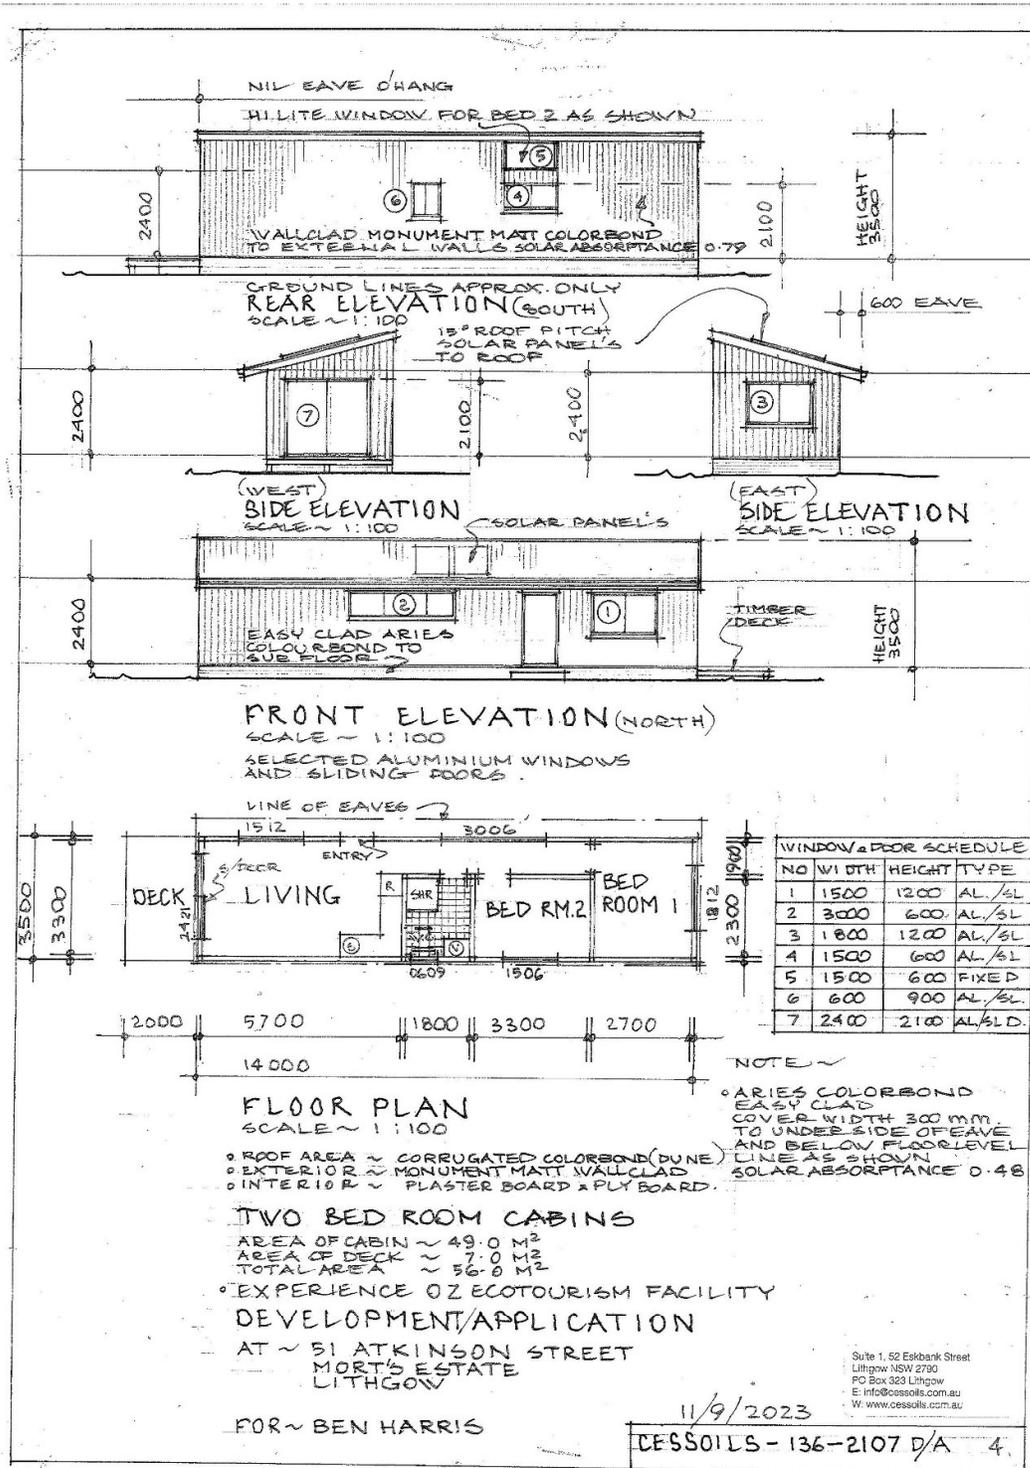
Floor plan and elevations of two-bedroom cabins
